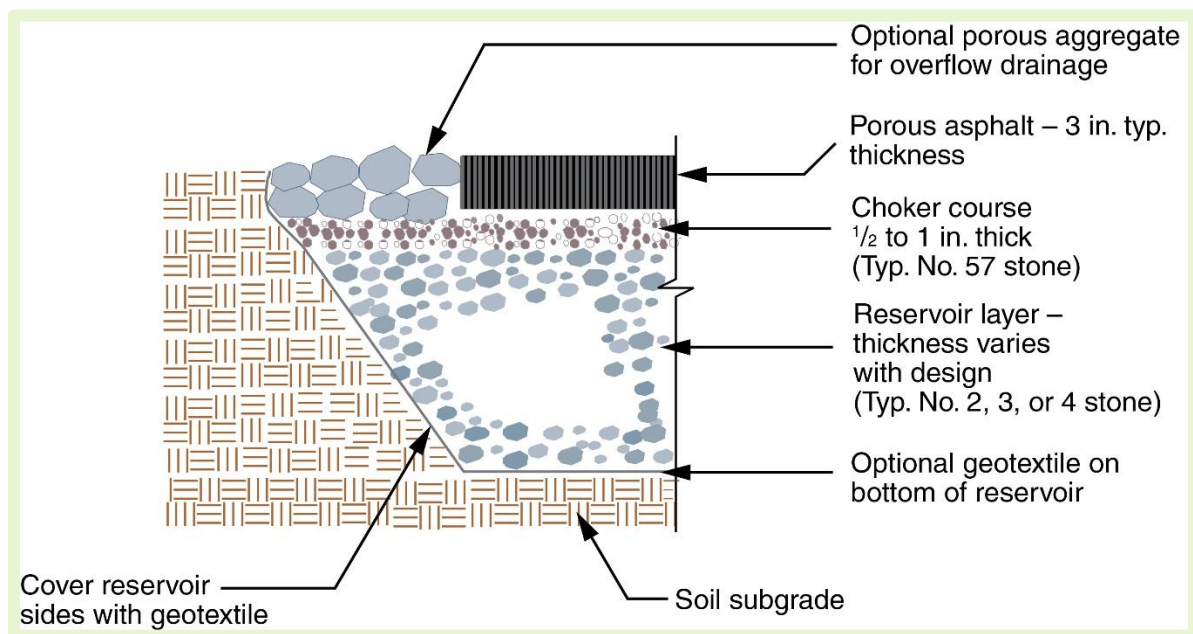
Typical Porous Asphalt Pavement Section (Credit: ICPI)
